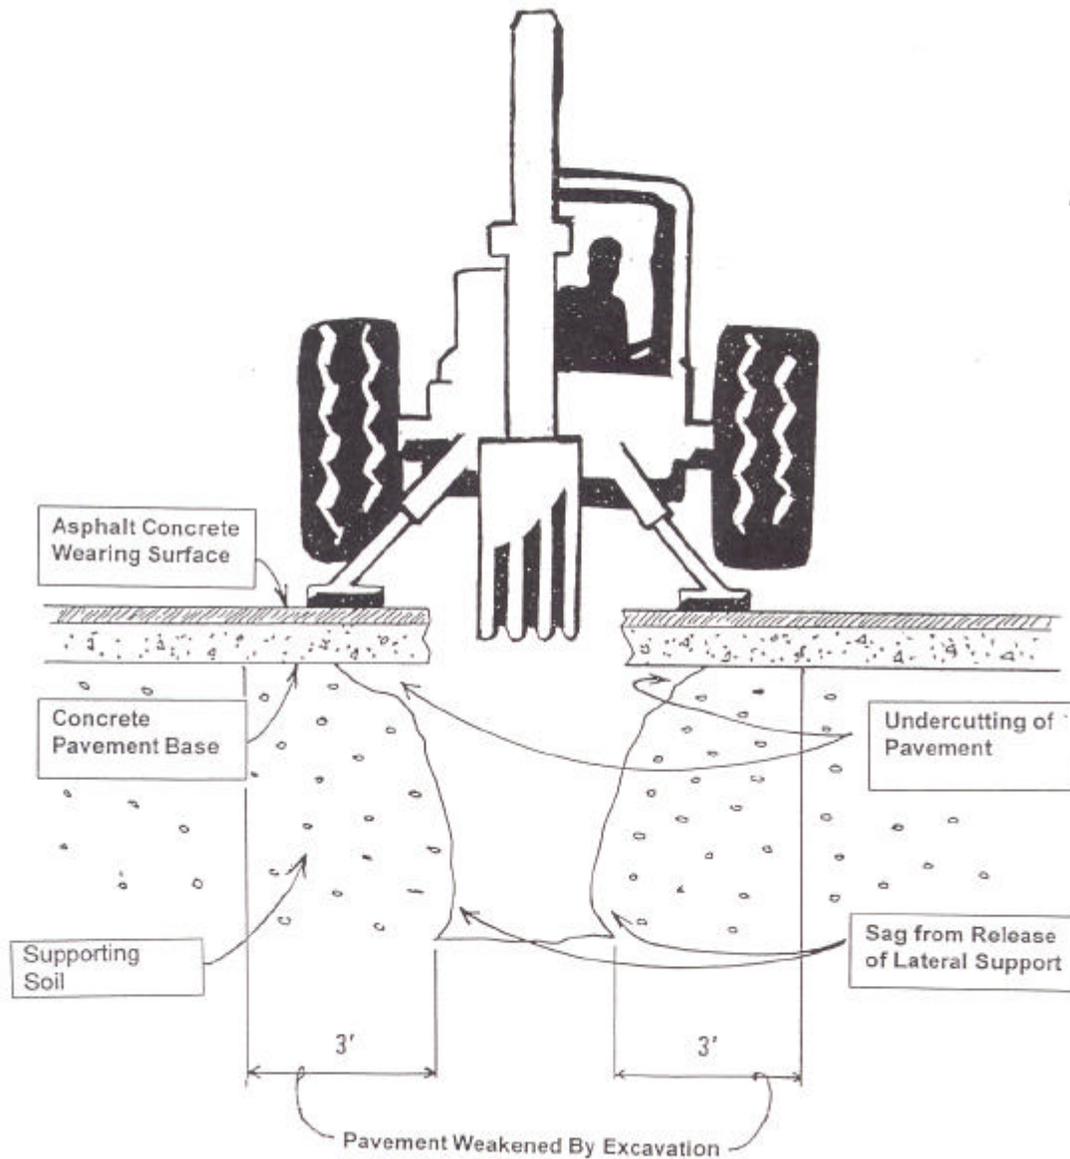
Typical Trench Excavation (*Impact of Excavation on San Francisco Streets, September 1998*).
